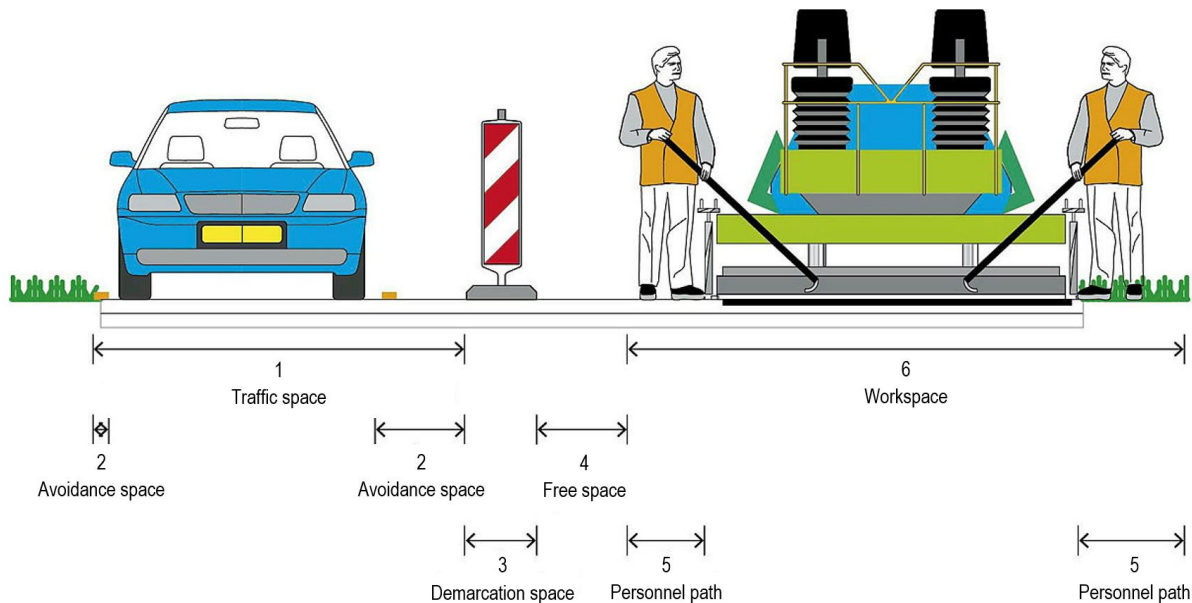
Cross-section of a road construction project (CROW, 2020a)
